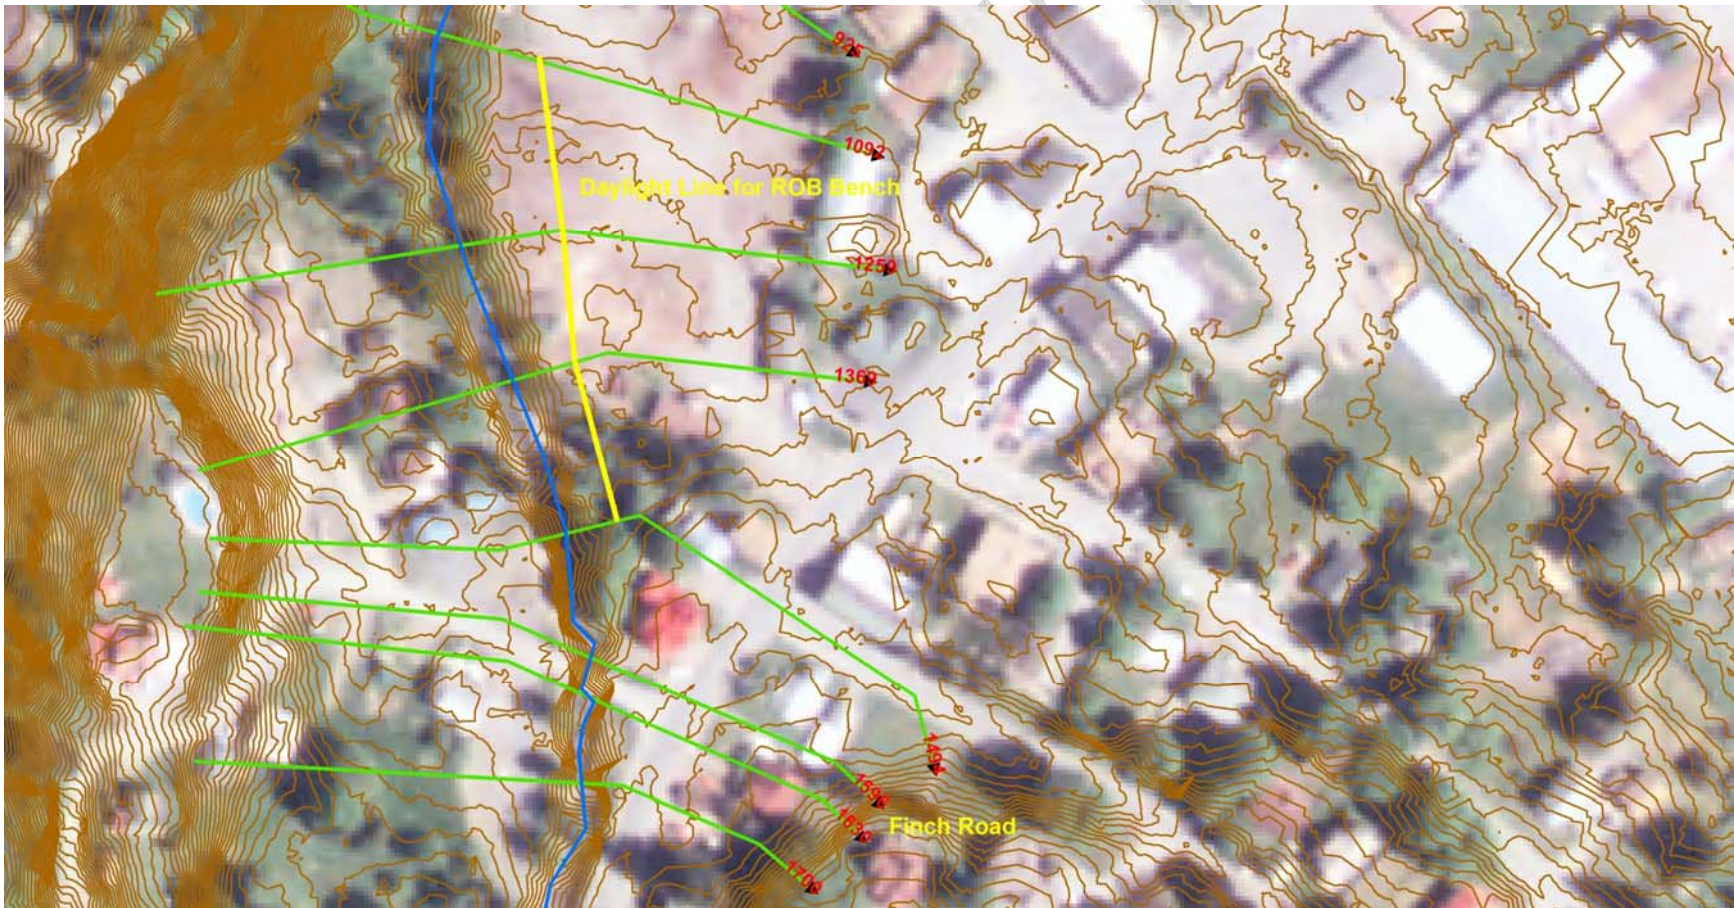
Conceptual Plan for Right Bench Downstream of Finch Bridge
